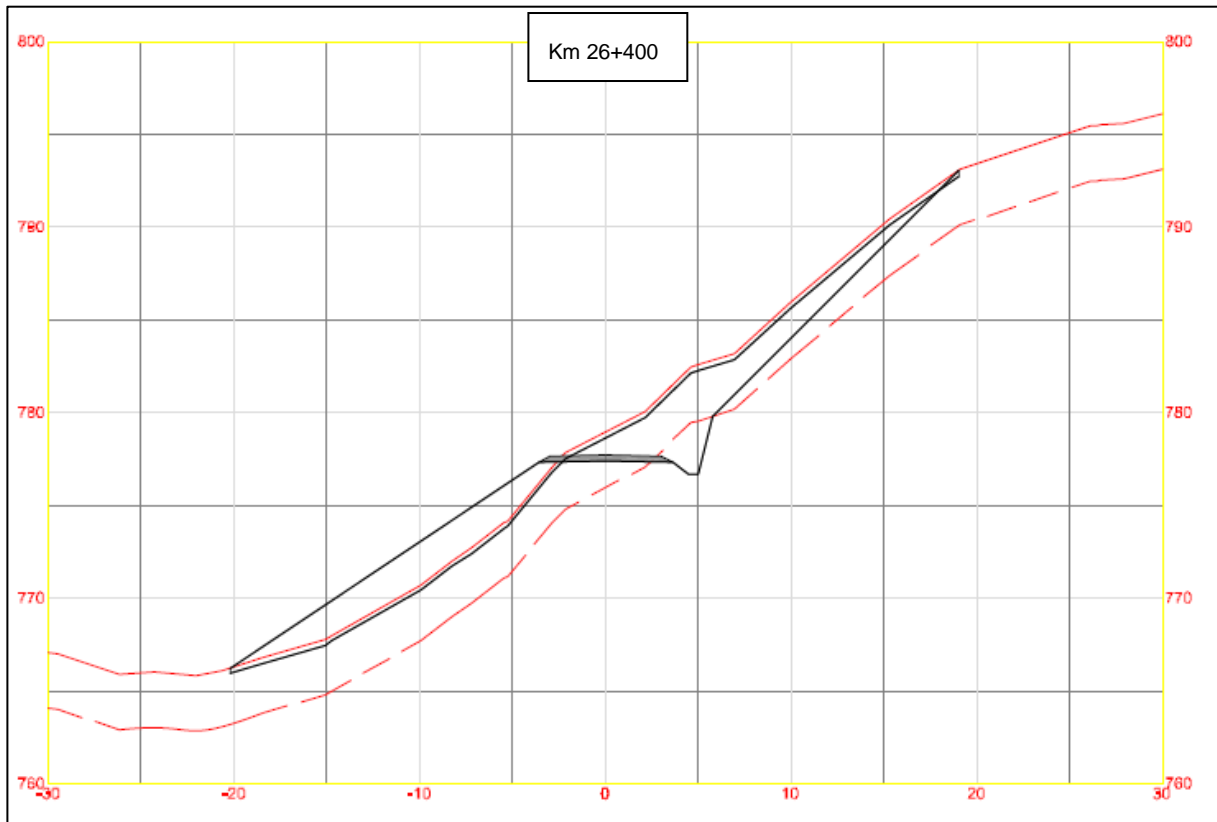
Example of Proposed Road Section that was Flagged for Field Review
